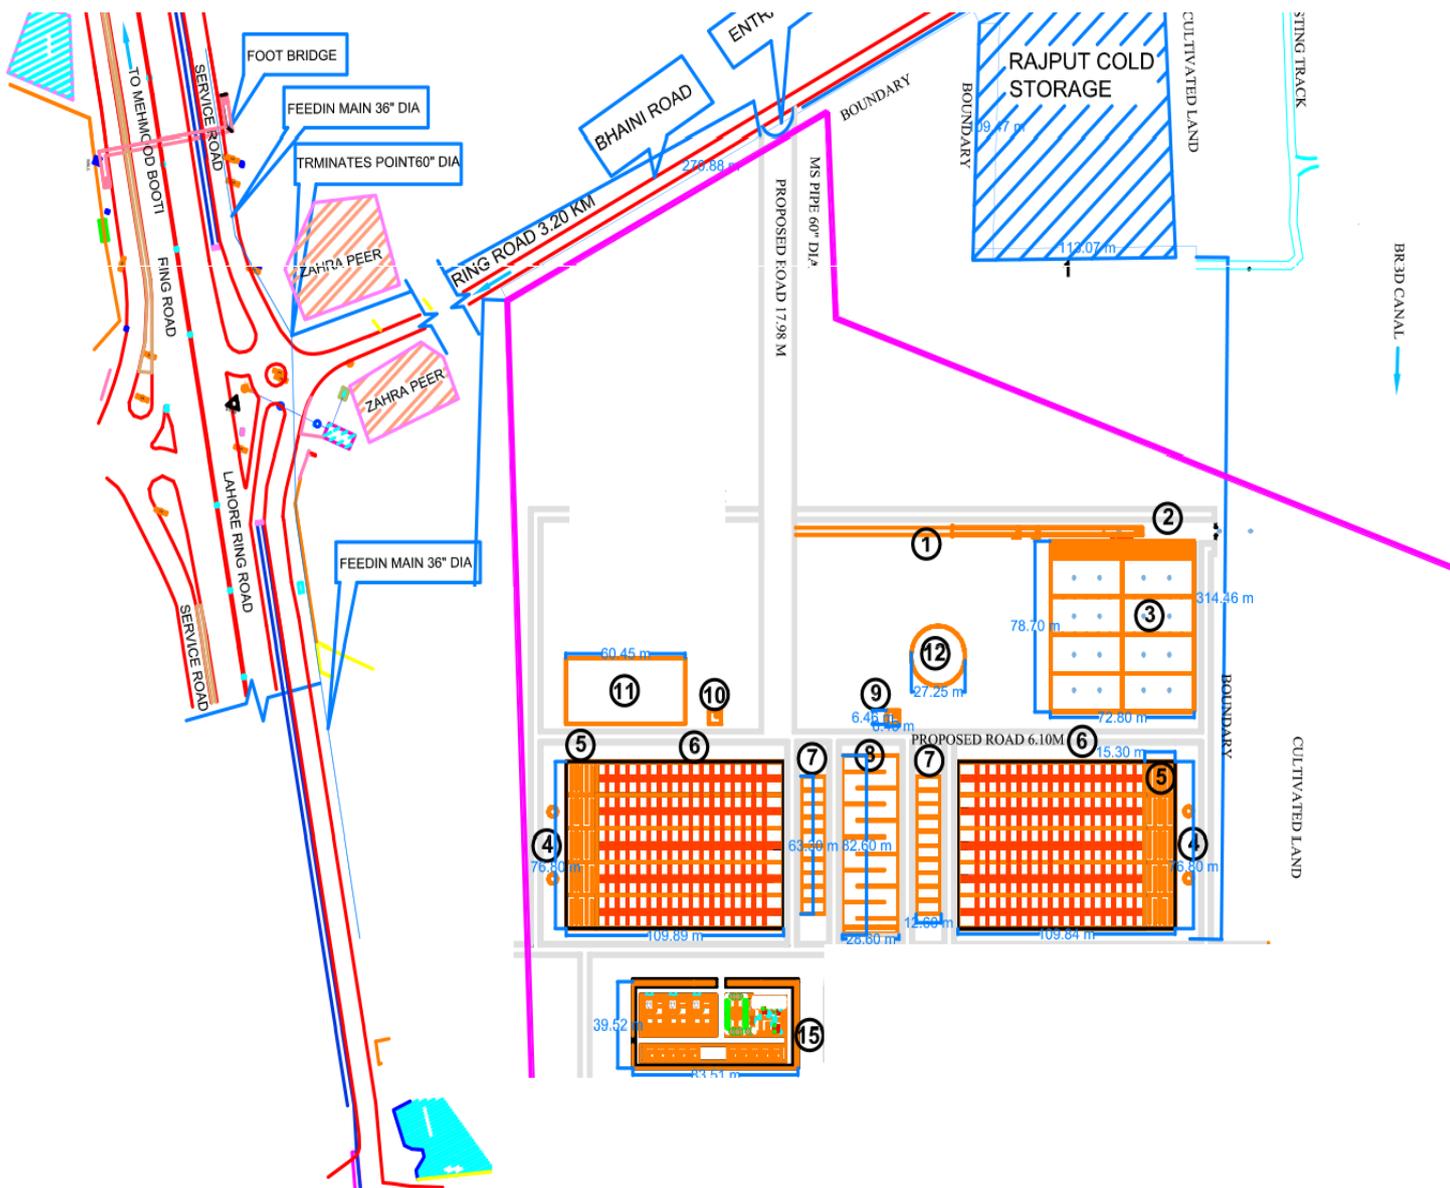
Layout Plan of Surface Water Treatment Plant
